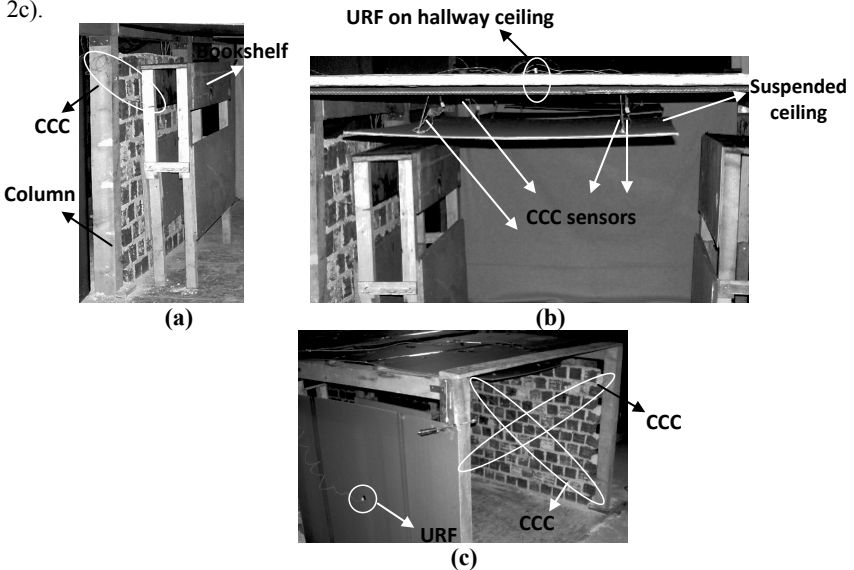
(a) CCC on bookshelves, (b) CCCs and URF on suspended ceiling, (c) CCC on walls and URF (only on Wall-1 and Wall-3).
